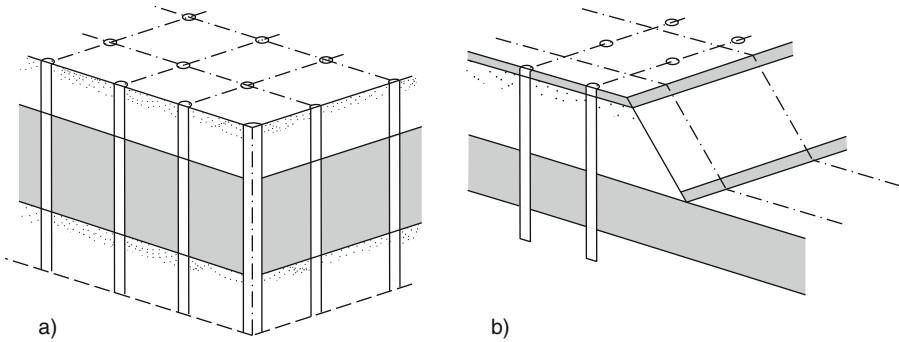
Groups of vertical piles with horizontal ground surface (a) and near a slope (b)
